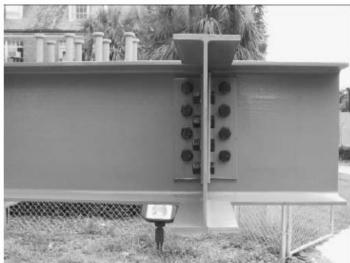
Shear Connection: All-bolted double angle Girder B1 / Beam B1B
